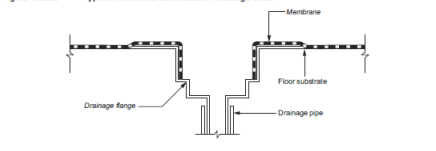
Typical enclosed stepped down shower construction (membrane below tile bed)
